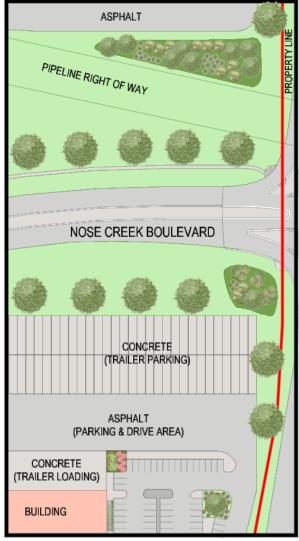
DETAIL A: LANDSCAPING CONCEPT AT WEST ENTRANCE A
